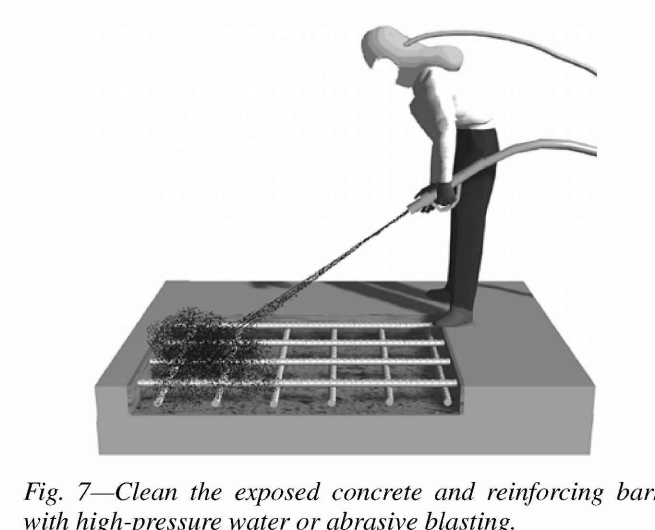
Clean the exposed concrete and reinforcing bars with high-pressure water or abrasive blasting.
